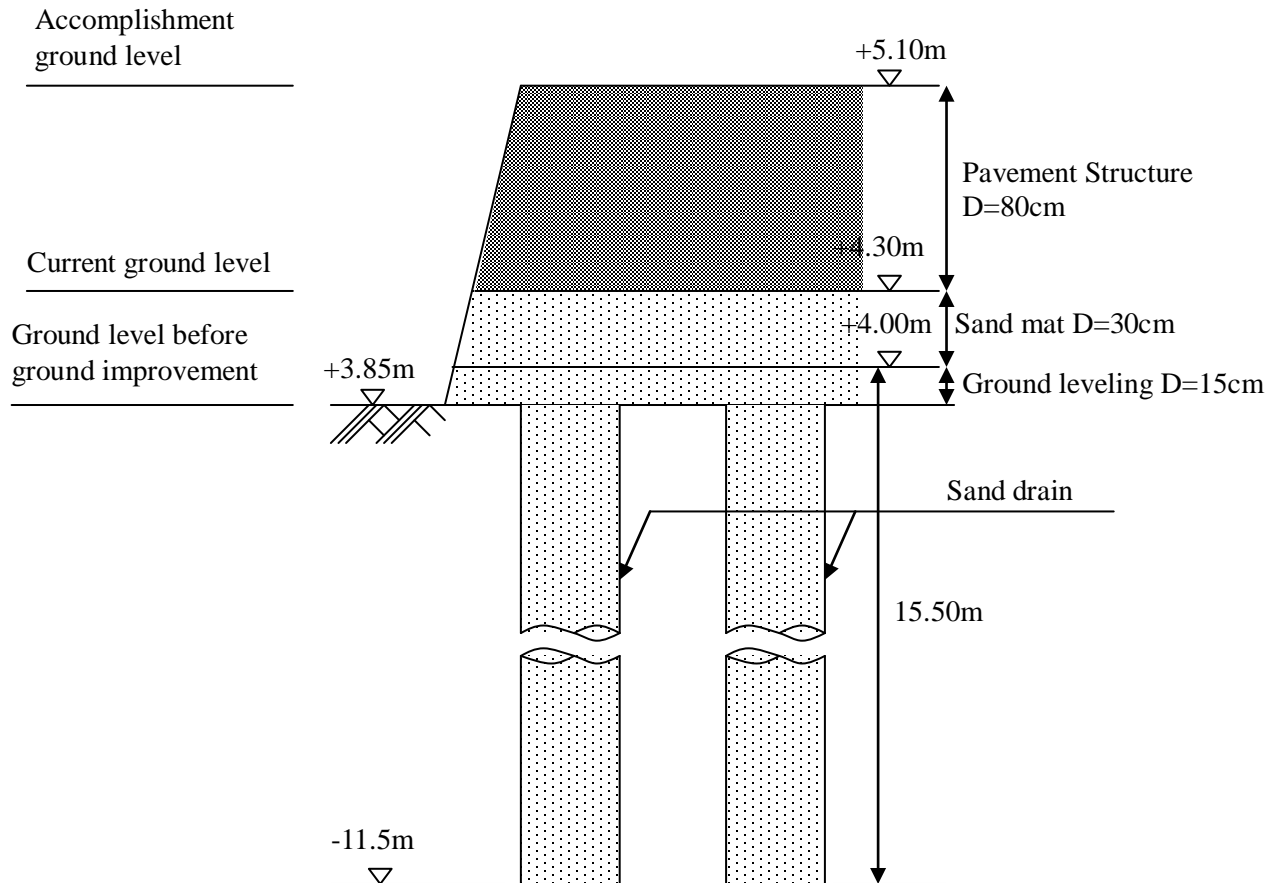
Sketch of cross section of the sand drain and planned pavement
